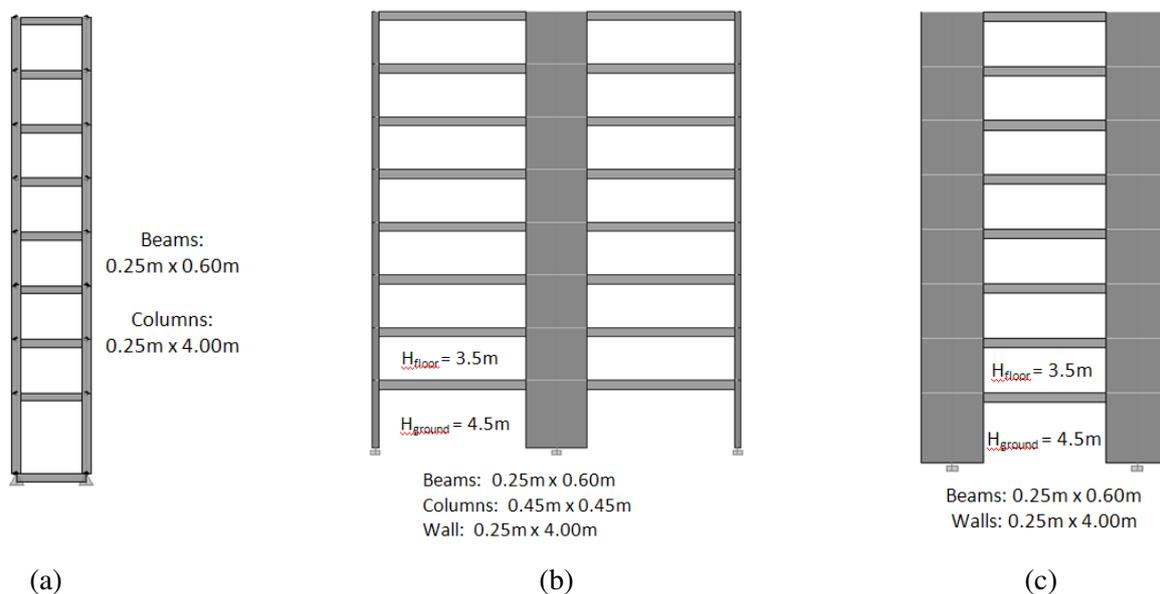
Characteristic r/c plain frames: (a) 8-floor one bay moment frame, (b) 8-floor dual (wall – frame) system, (c) 8-floor frame with coupled shear walls.
